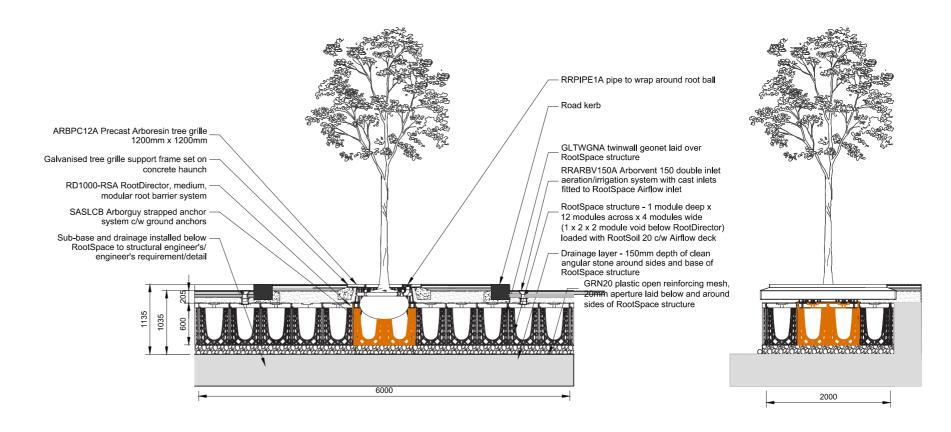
Example of the proposed tree pit system previously used in London - Sections
